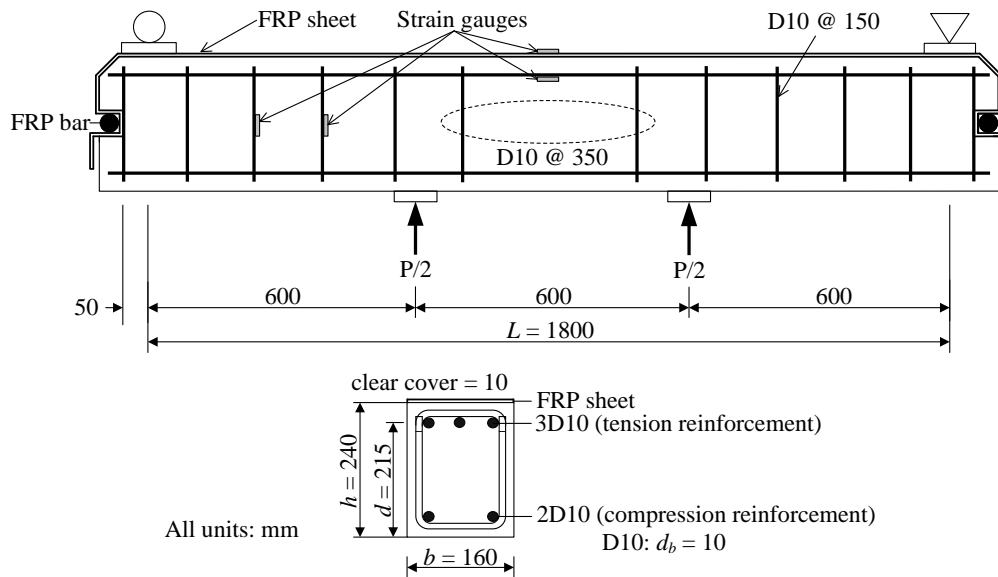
Test Specimen and Set-Up Details for Reinforced Concrete Beams Strengthened with FRP Sheets
